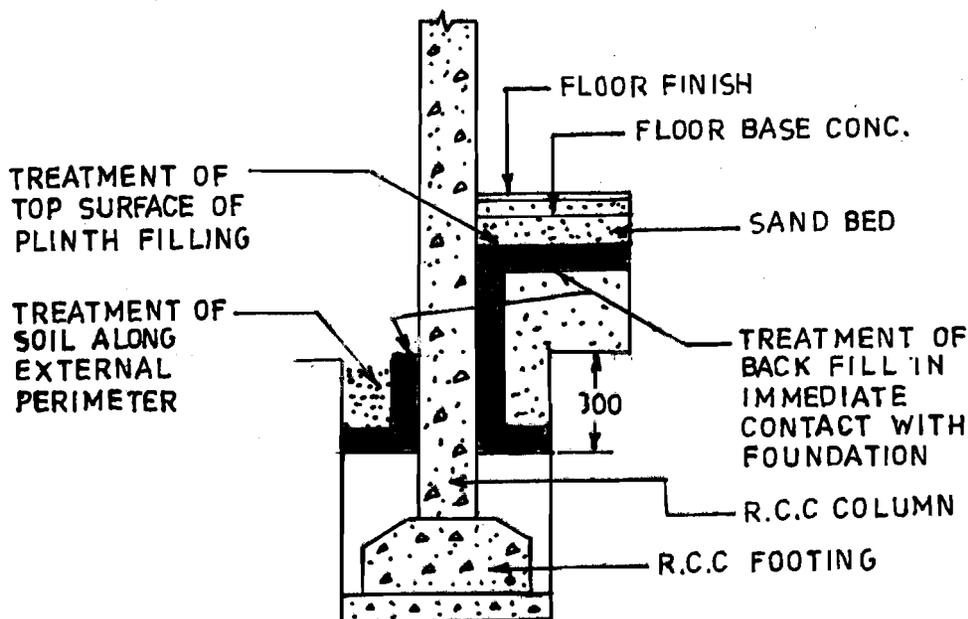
R.C. Framed Structure With Column & Plinth Beams
